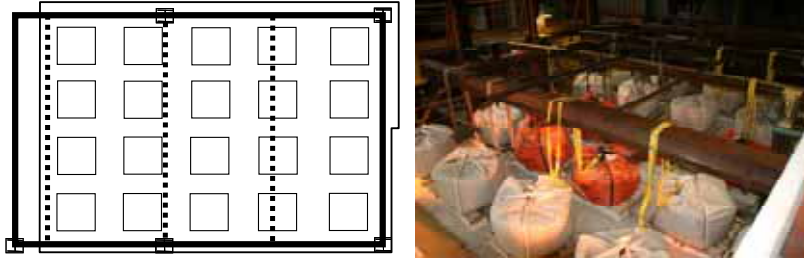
Loading conditions of steel and concrete composite floor exposed to fire
